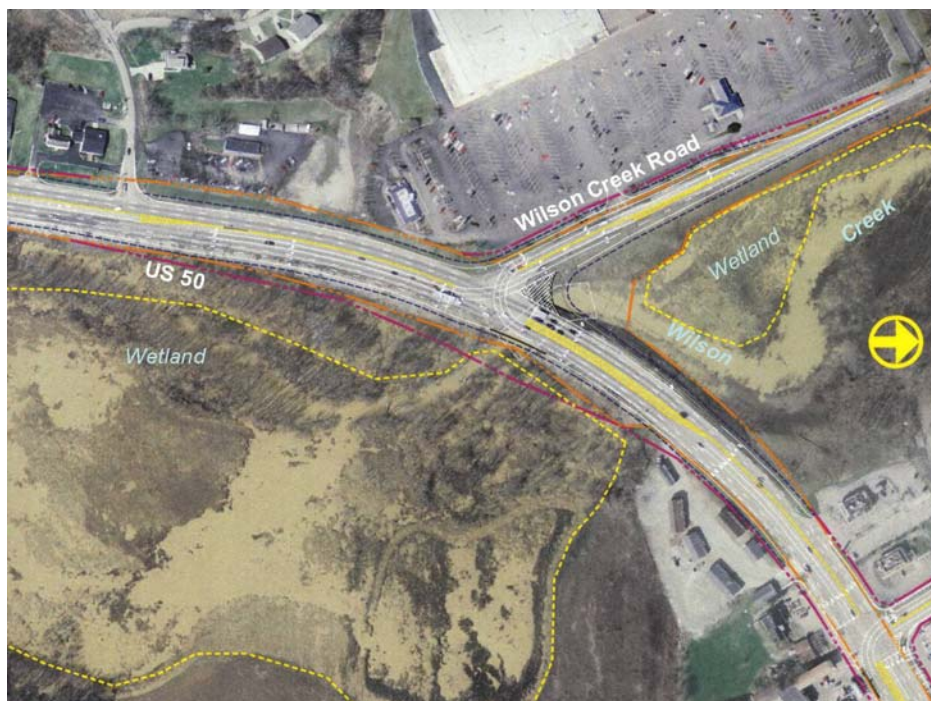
Intersection Improvement: US 50 and Wilson Creek Road
